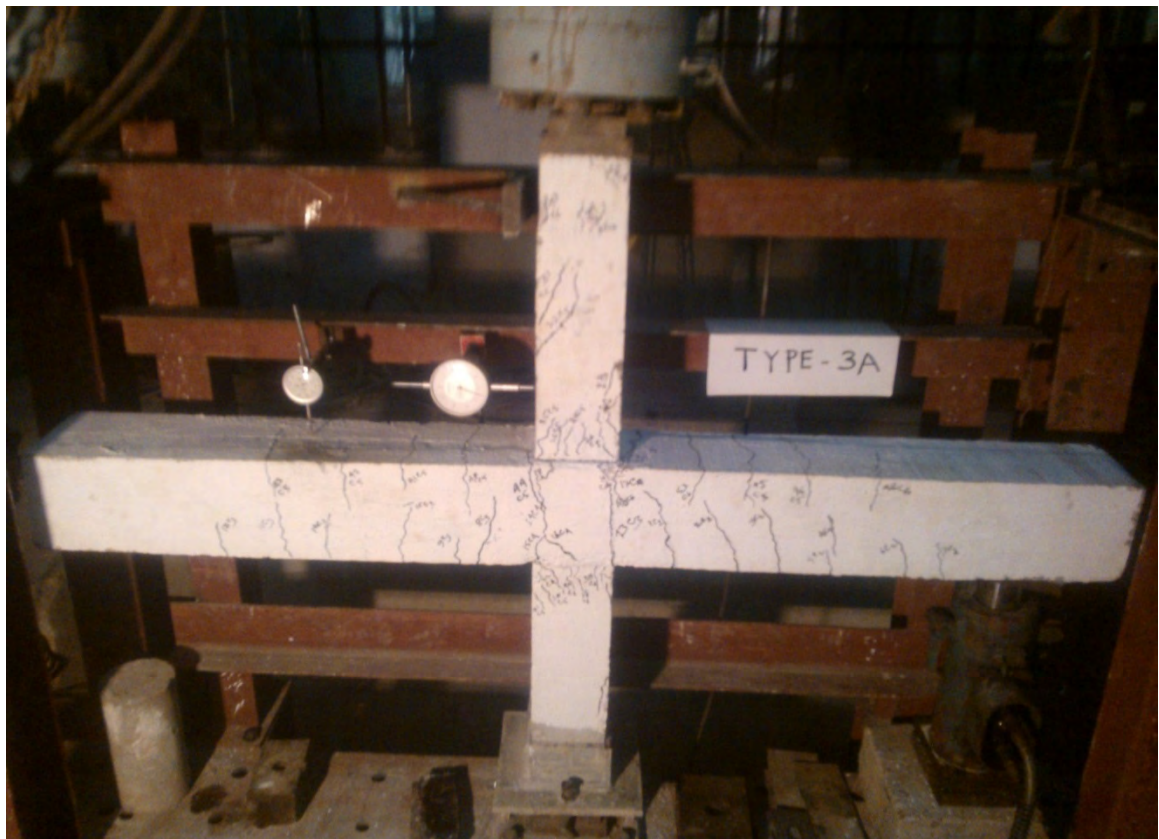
Final Crack Pattern of Type 3A Specimen
